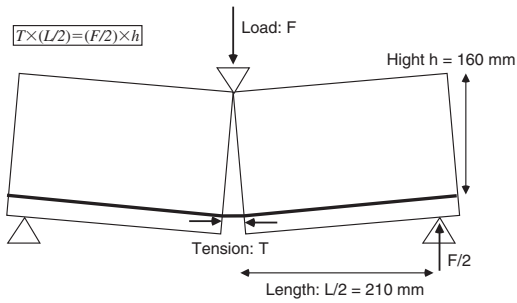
Schematic diagram of force equilibrium in a beam with reinforcement.
